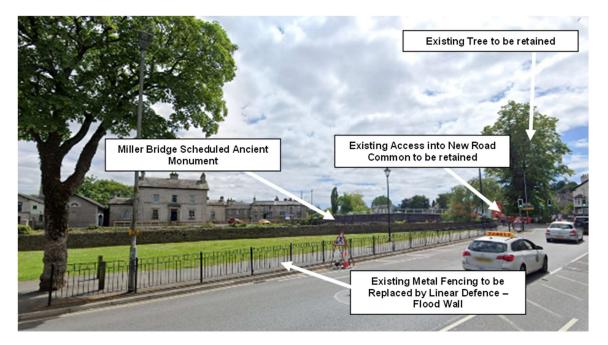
Photograph to illustrate the metal fencing to be replaced and access to be retained at New Road Common in the area adjacent to Miller Bridge
